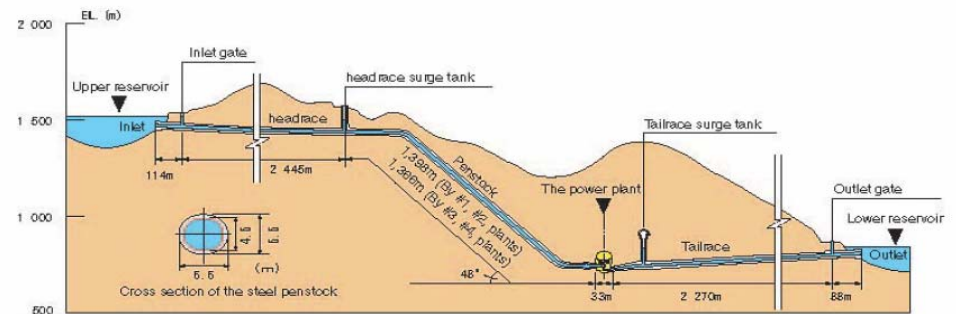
Vertical sectional plan of water tunnels in Kannagawa power plant
